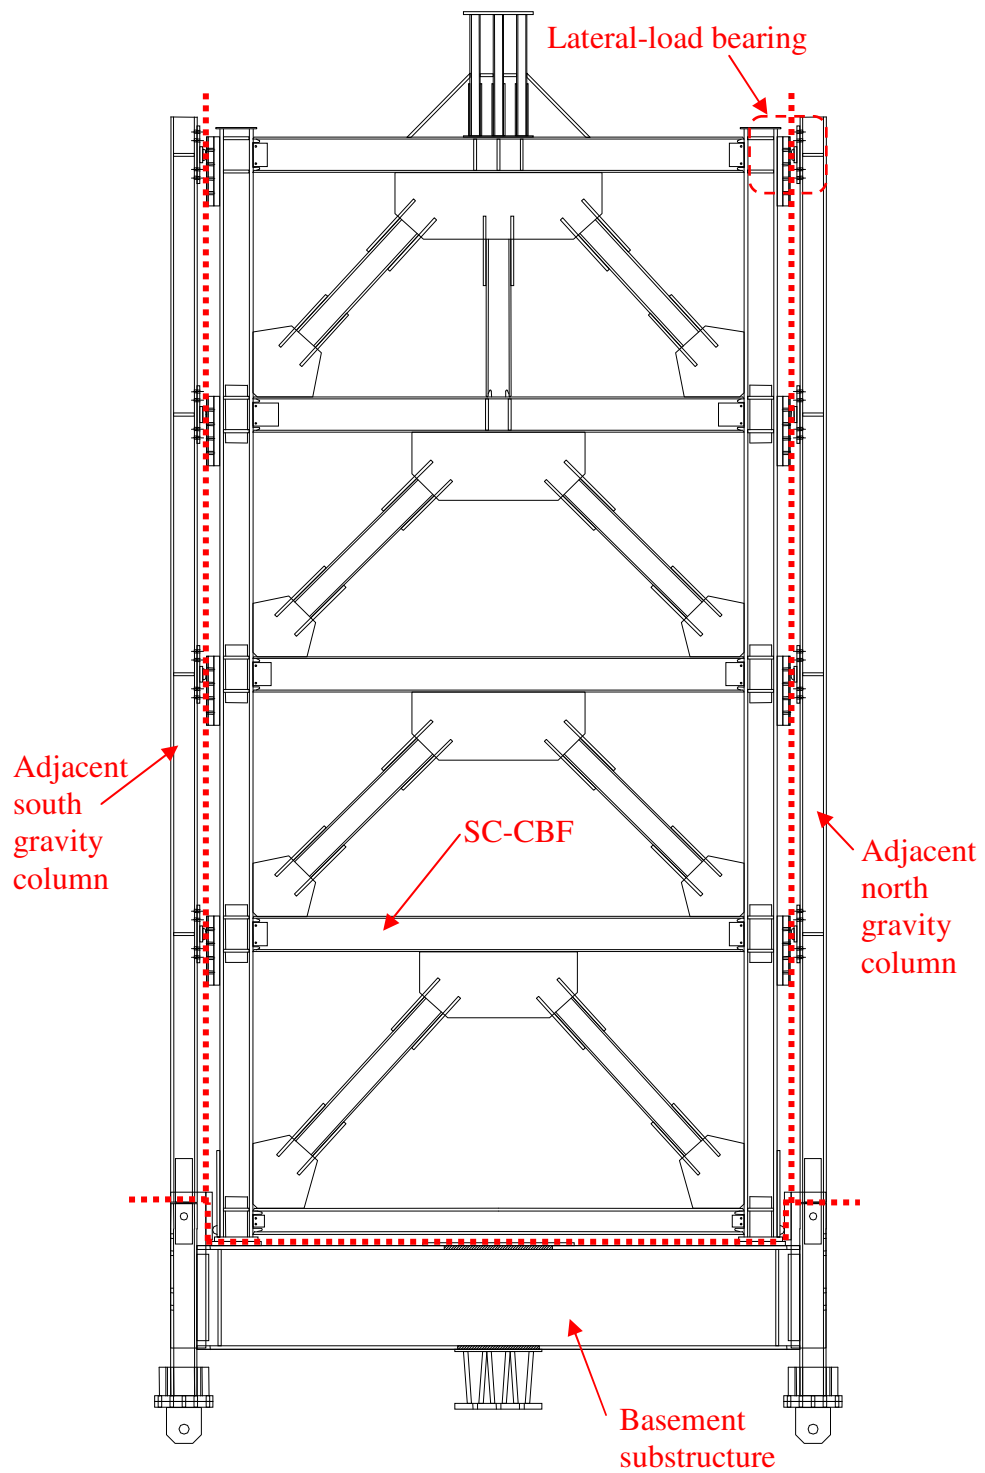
Drawing of SC-CBF test structure, including basement substructure and adjacent gravity columns
